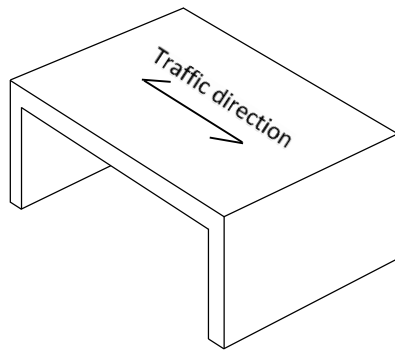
An example of a portal frame bridge. The two abutments are rigidly connected to the bridge deck.
